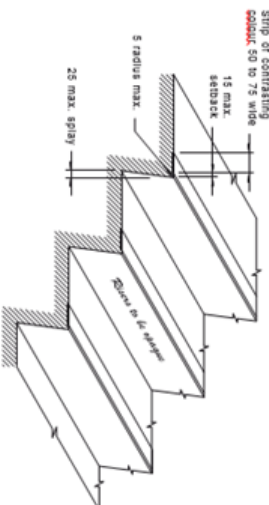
(A). TYPICAL STAIR NOSING PROFILE WITH NOSING STRIP
